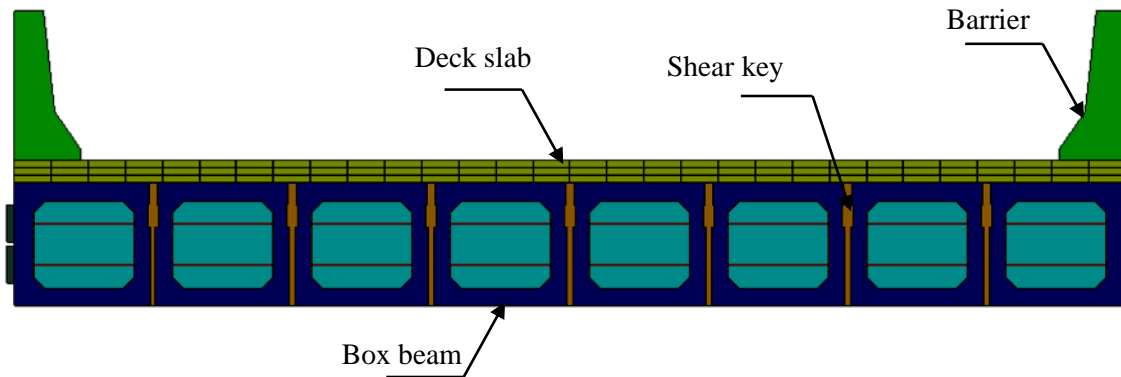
Typical cross section of side-by-side box beam bridges
